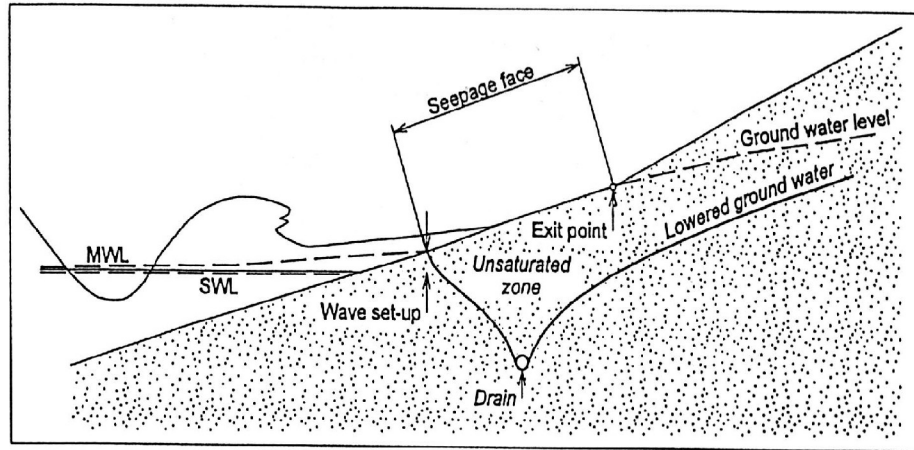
Cross-Section. Water table lowered by beach drain (not to scale)
